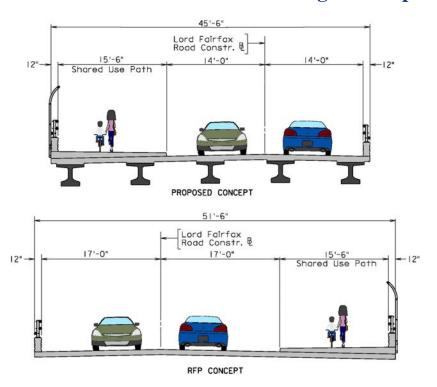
Typical Transverse Section (Looking West)
